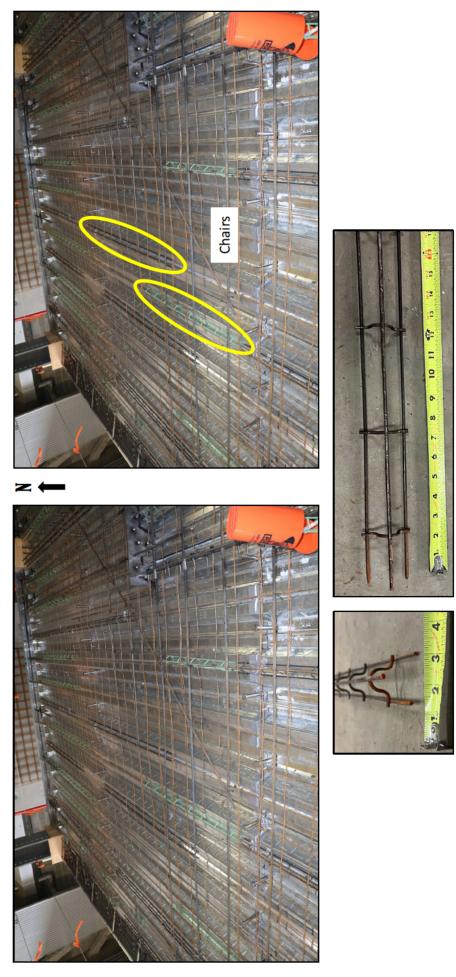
Construction photo of the northwest corner of the test frame showing the WWR mesh used as shrinkage reinforcement in the concrete slab.
